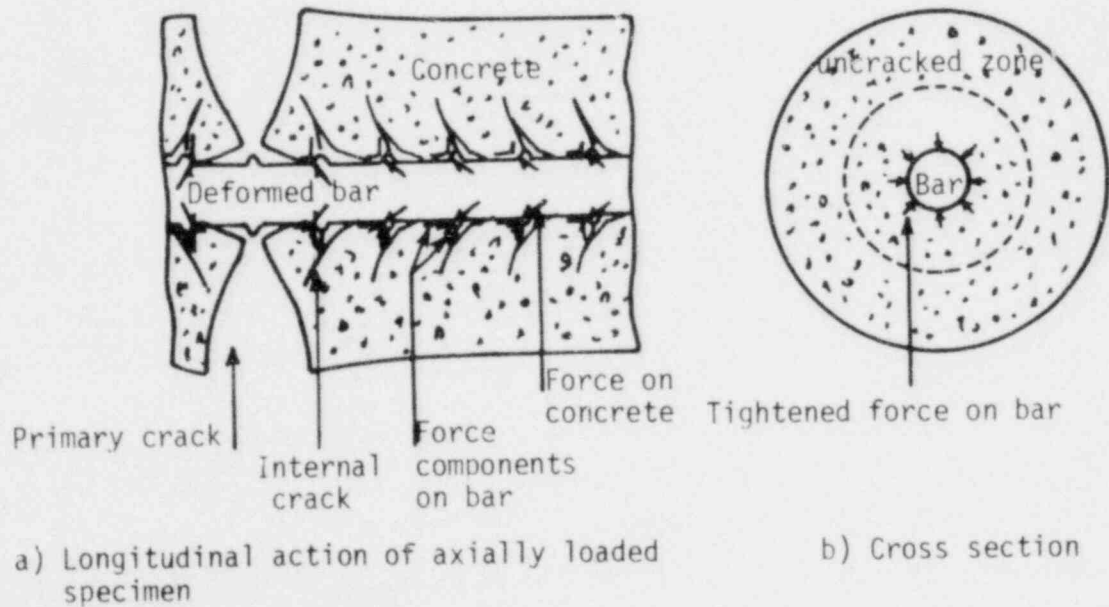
Deformation of concrete around reinforcing steel after formation of internal cracks according to Goto (Ref. 49).
